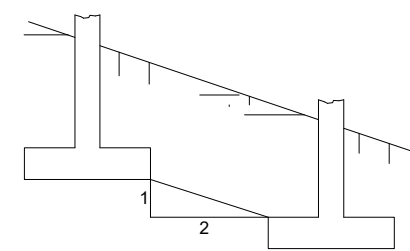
DETAIL OF LIMITING SLOPE OF ADJACENT FOOTINGS
